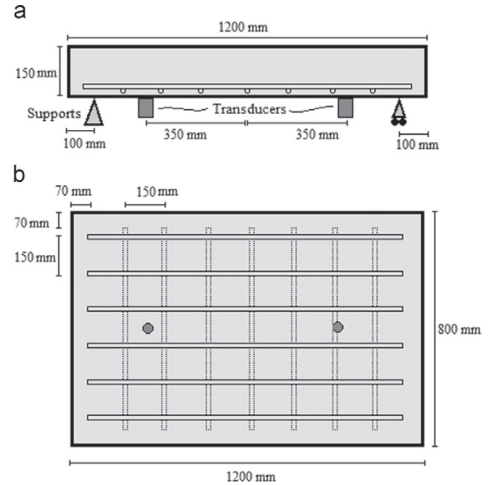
Concrete dimensions, reinforcement layout and transducer locations. Concrete slab seen from the side (a) and from above (b).
